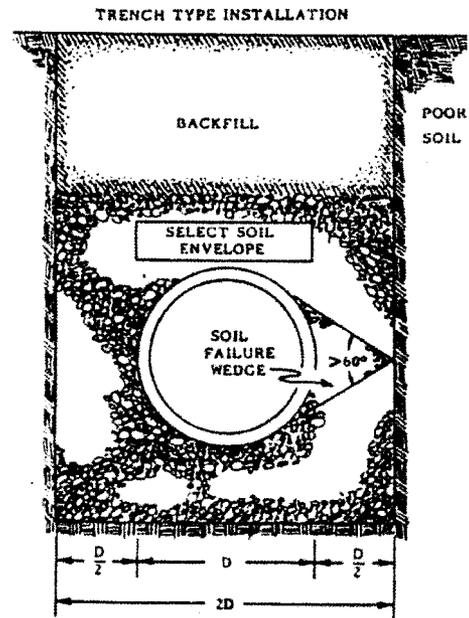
Minimum Embedment Width When Trench and Native Soil Can Sustain a Vertical Cut
